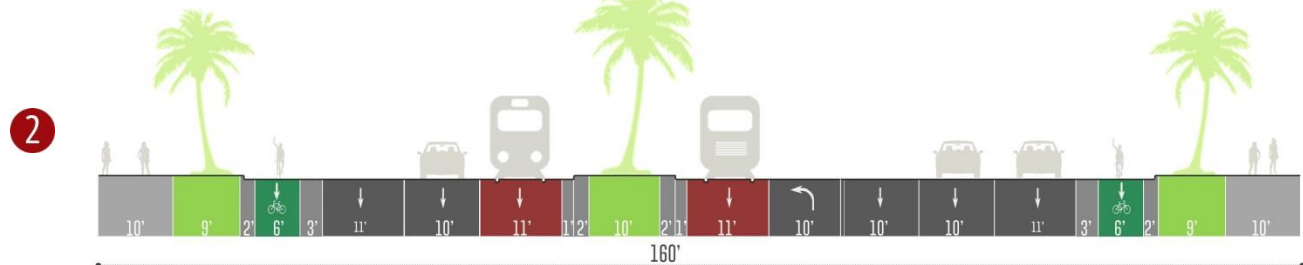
SR A1A/ 5th Street Transit Corridor Potential Typical Section from SR 907/Alton Road to Washington Avenue
